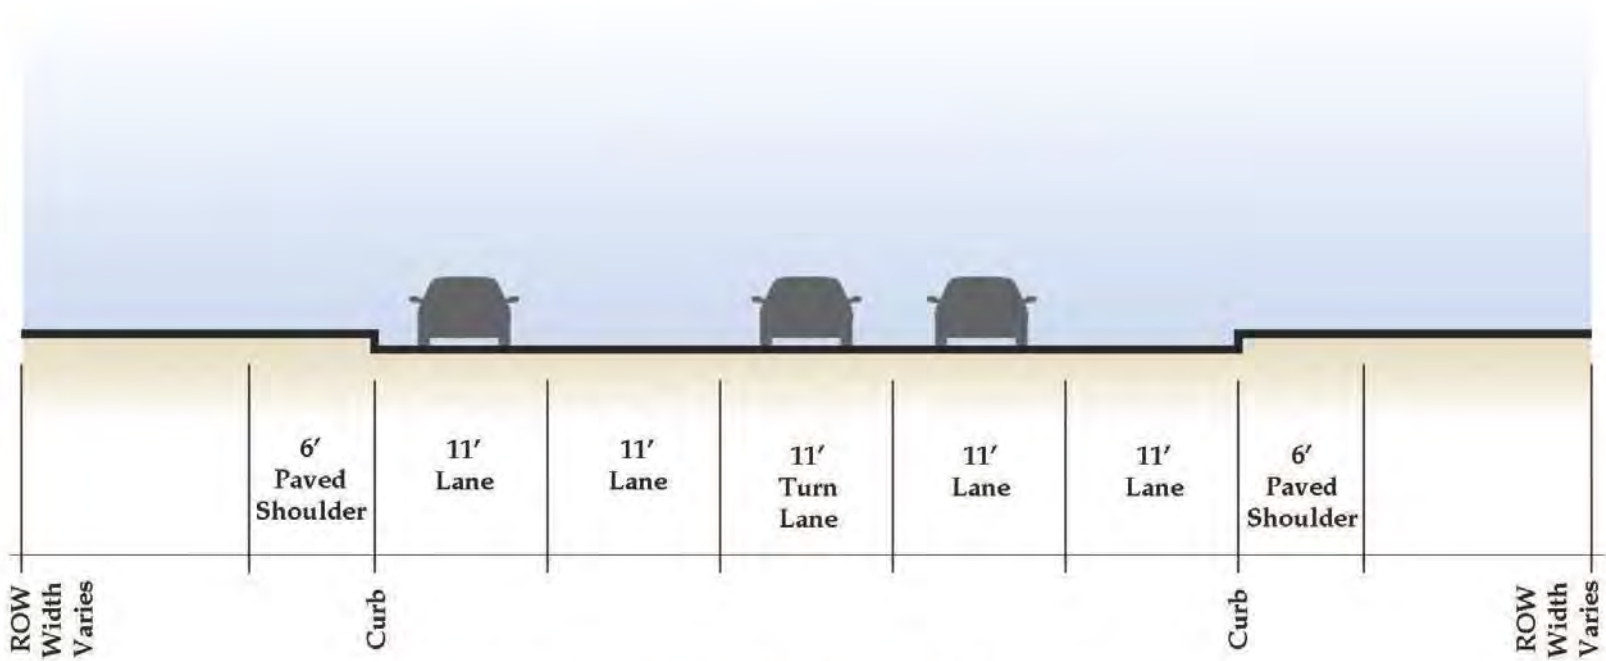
Illustration I. Typical Existing US-10 Cross Section - Jackson Road to Pere Marquette Highway
